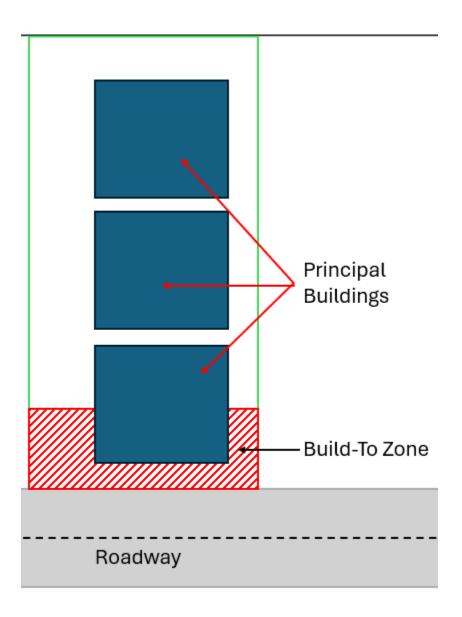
Illustration depicting additional buildings placed behind the first principal building in the Build-To Zone
